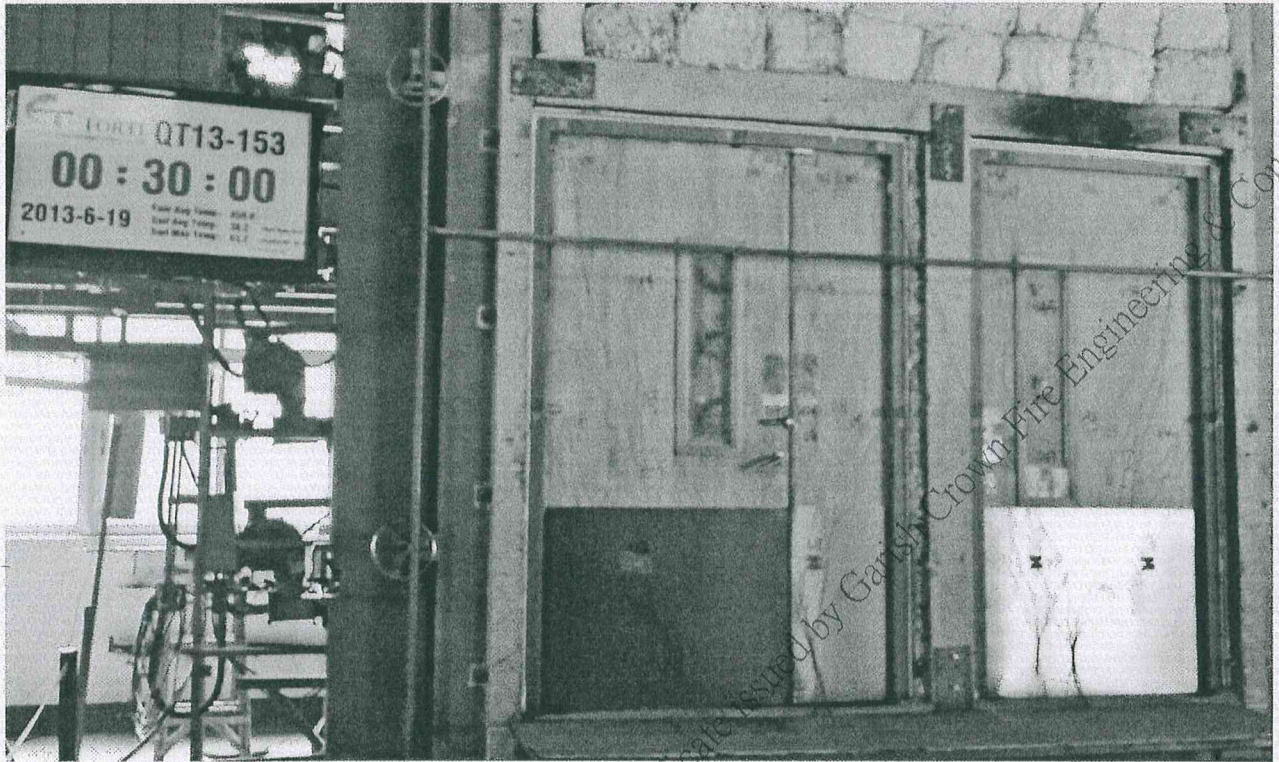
Unexposed surface of the specimen at 30 minute of test. (Left: Door A; Right: Door B)
